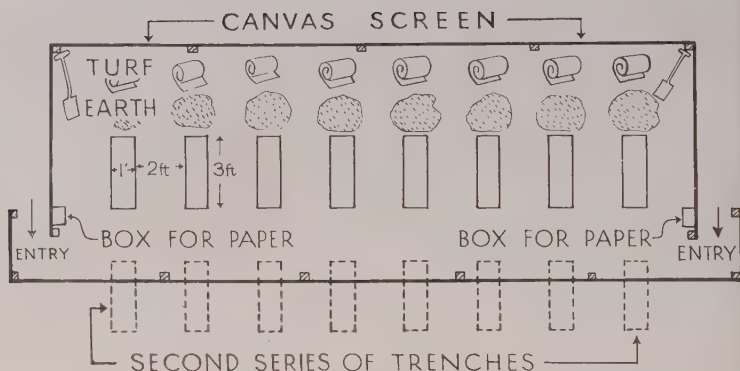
PLAN OF SHALLOW TRENCH LATRINE
